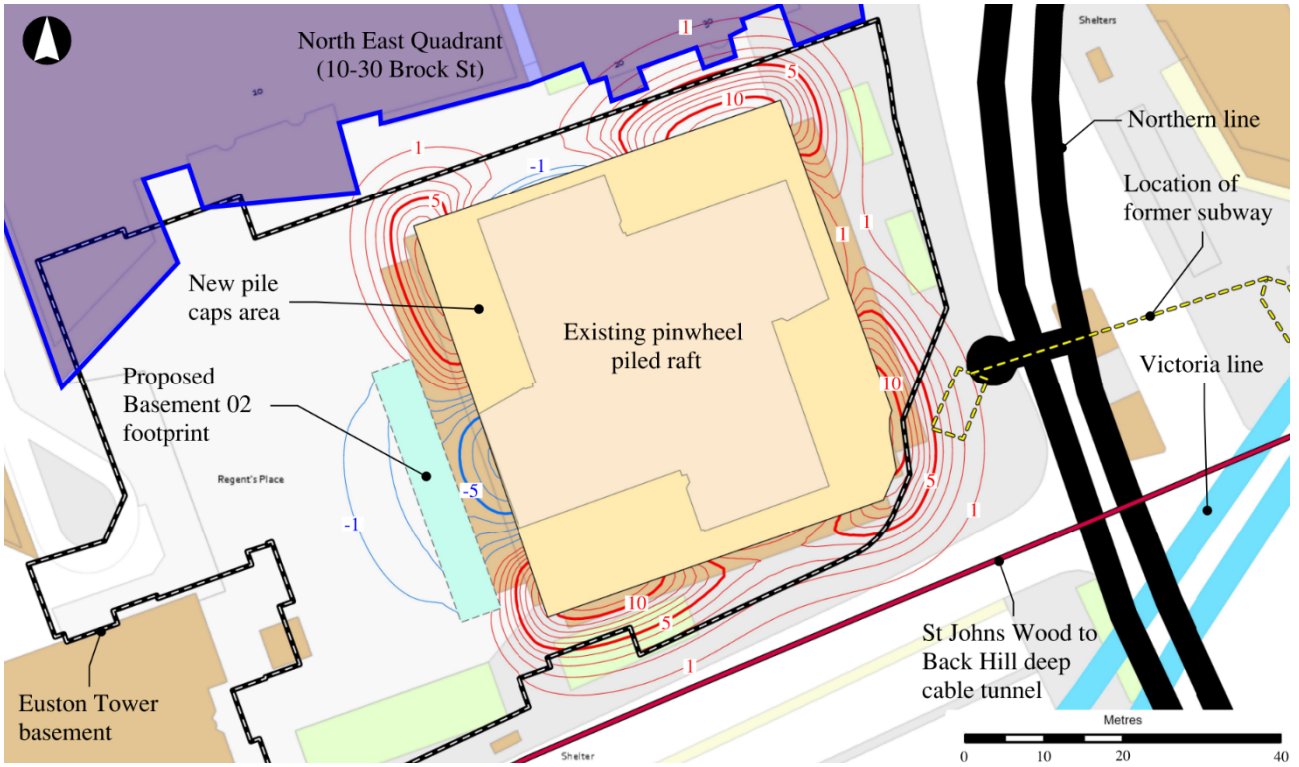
Calculated short term ground movement (mm) at basement level +21.6mOD resulting from partial superstructure deconstruction, proposed Basement 02 excavation, B1 slab lowering and new superstructure loading (downward movements are presented as +ve).
